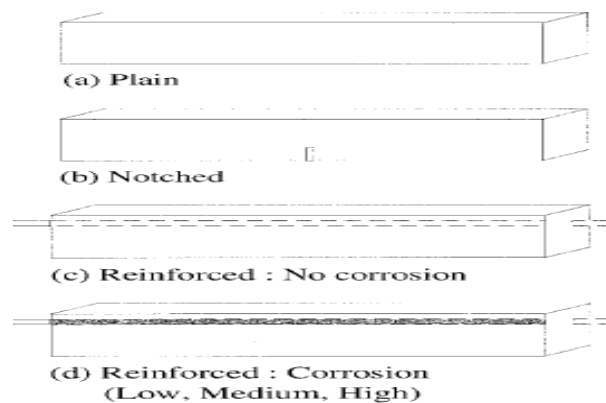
Types of concrete beam specimens (Yoon et al., 2000)
